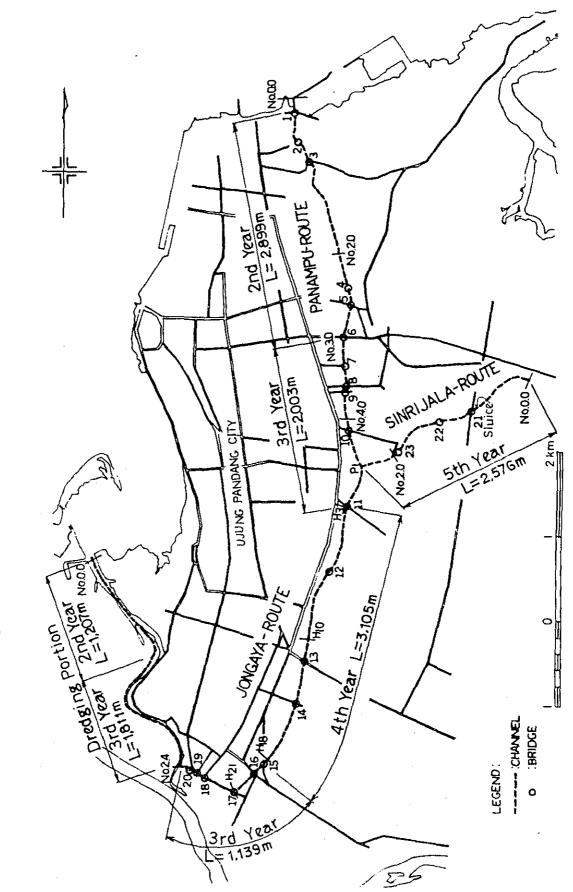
DRAINAGE CHANNEL WORK SECTION
